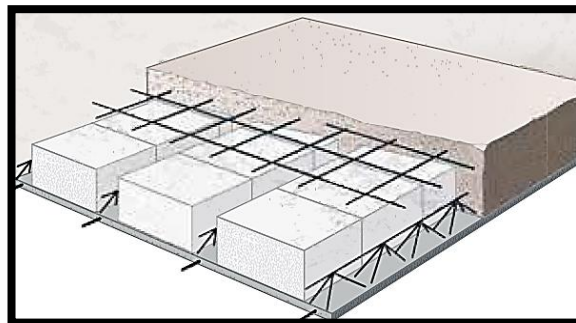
Floor slabs consisting of precast R/C slab and "lightening" blocks. (Source: Leca)
